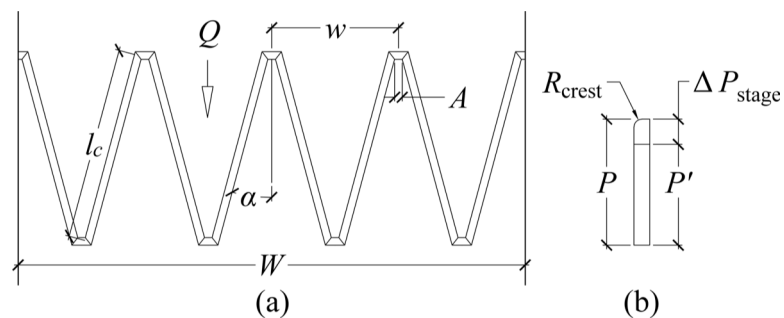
Plan (a) and elevation (b) views of labyrinth weir with geometric and hydraulic variables
